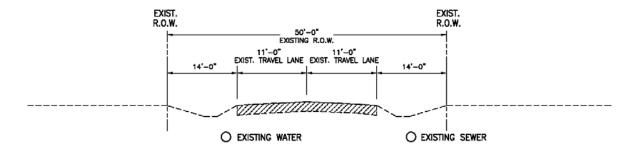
Existing Typical Asphalt Roadway Section along Minnesota Park Road (Source: RCLC)
